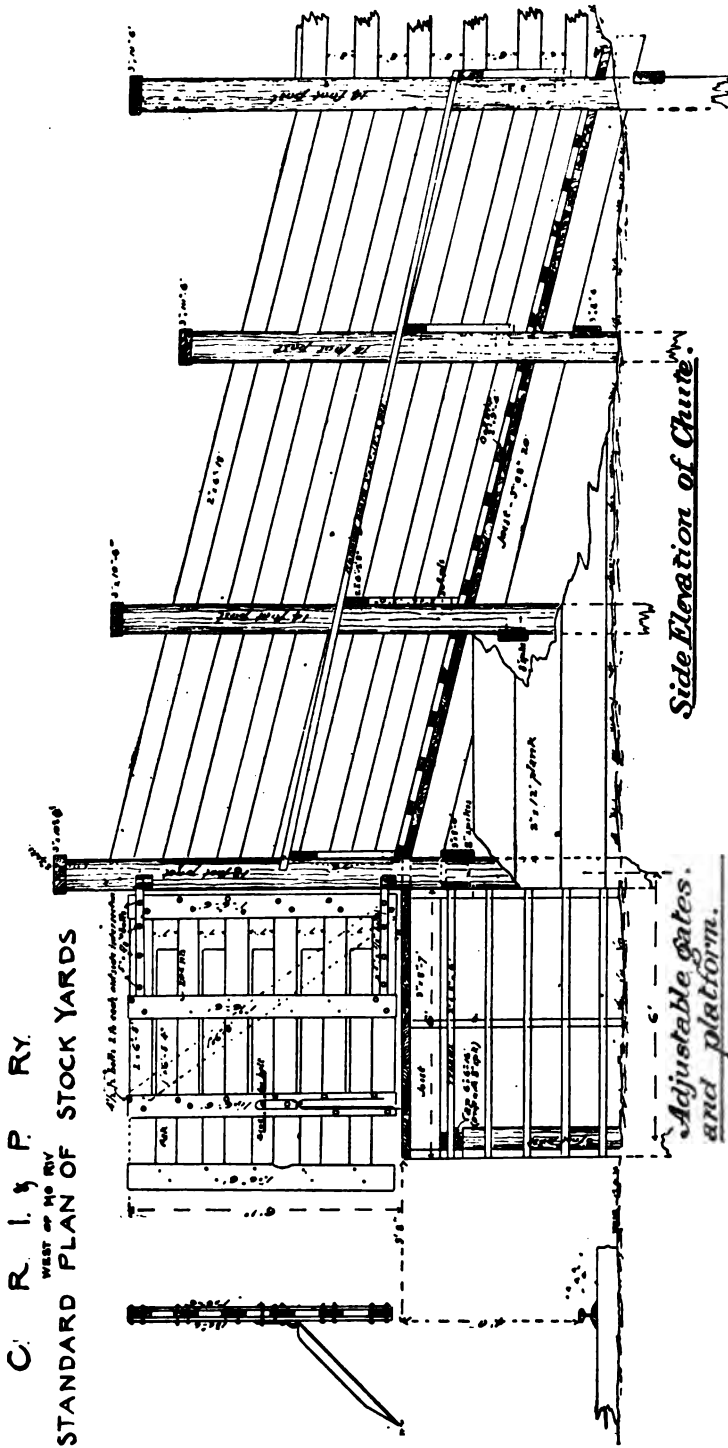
STOCK YARD DETAILS, CHICAGO, ROCK ISLAND AND PACIFIC R. R. (PLAN NO. 14—CONTINUED.) REPORT ON STOCK YARDS AND STOCK SHEDS.
